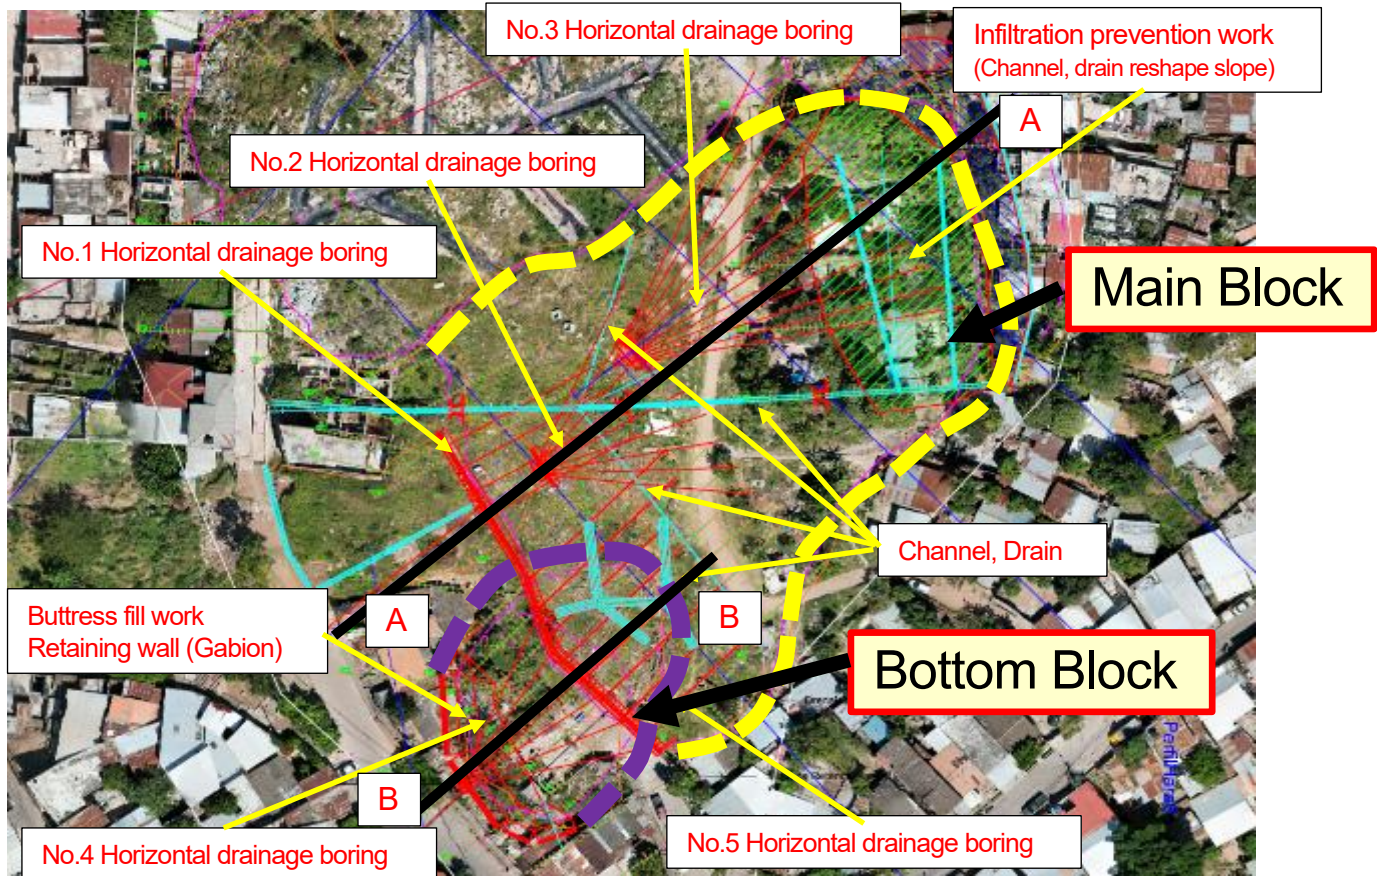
Plan view of countermeasure (Nueva Santa Rosa)
